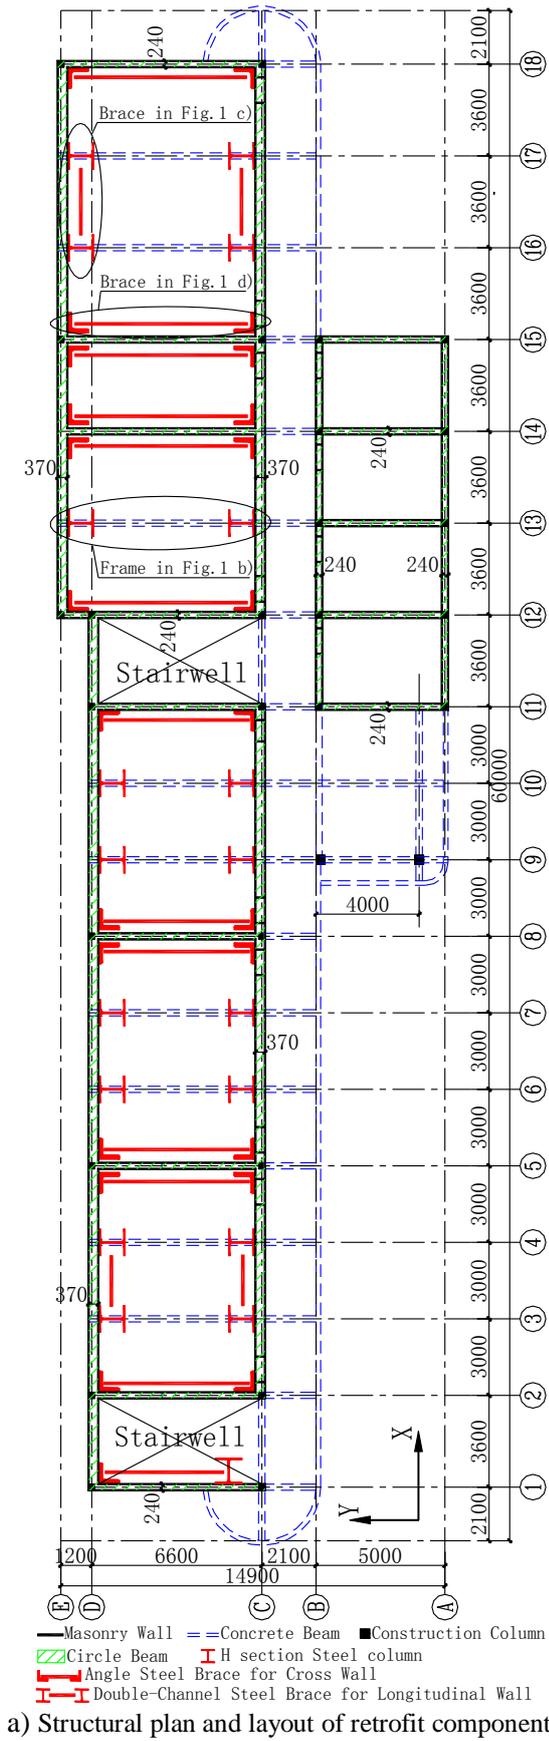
Structural plan and retrofit components layout of the comprehensive building site's first storey (mm)
